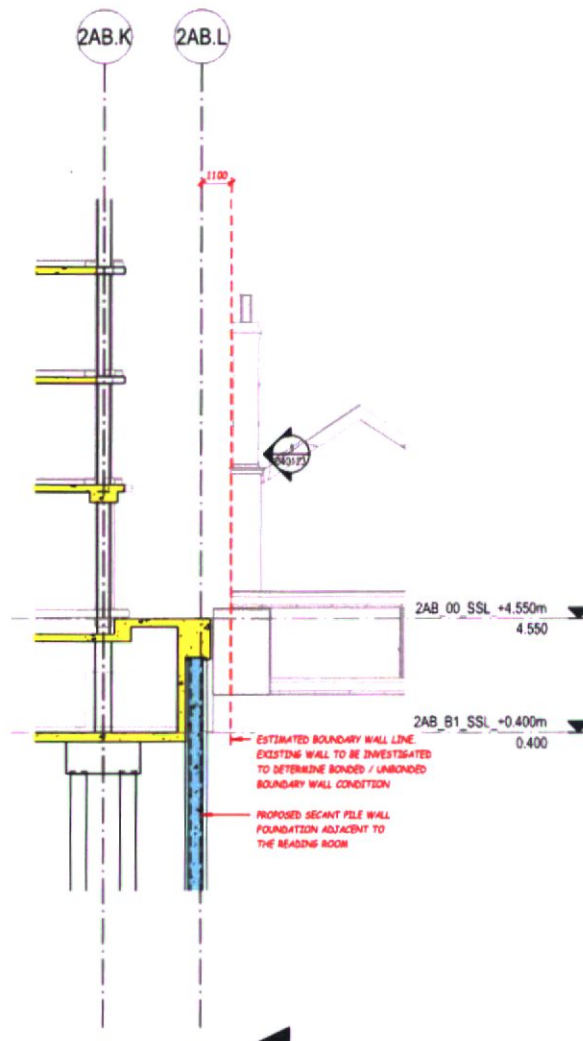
Secant Wall Adjacent to Existing Reading Room Basement
